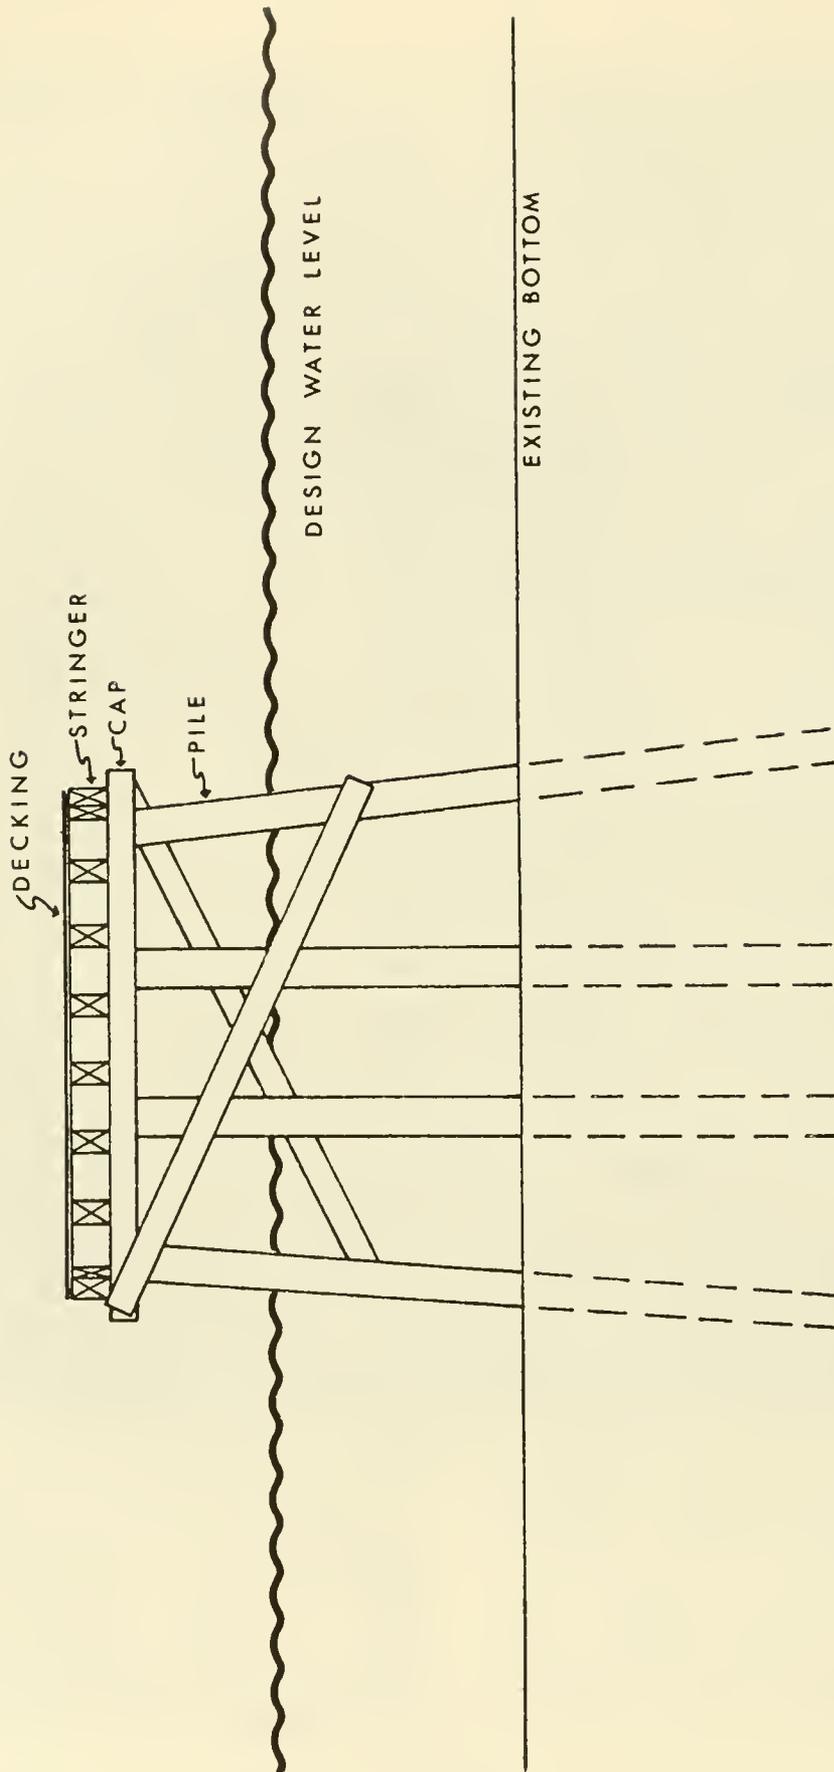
Cross-sectional view of a typical pier. Dimensions and details to be determined by particular site conditions.
